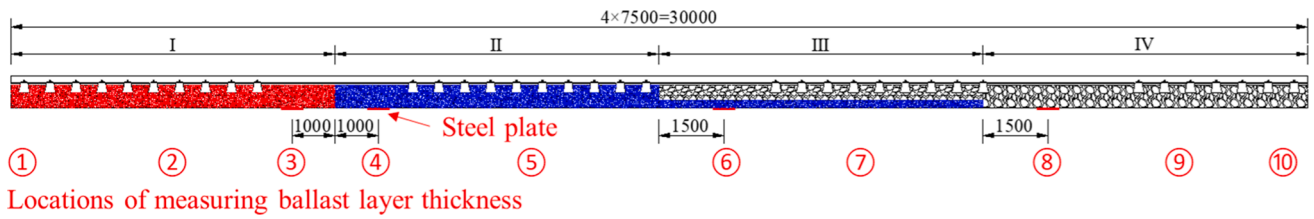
Longitudinal section of full-scale ballasted track (unit: mm).
